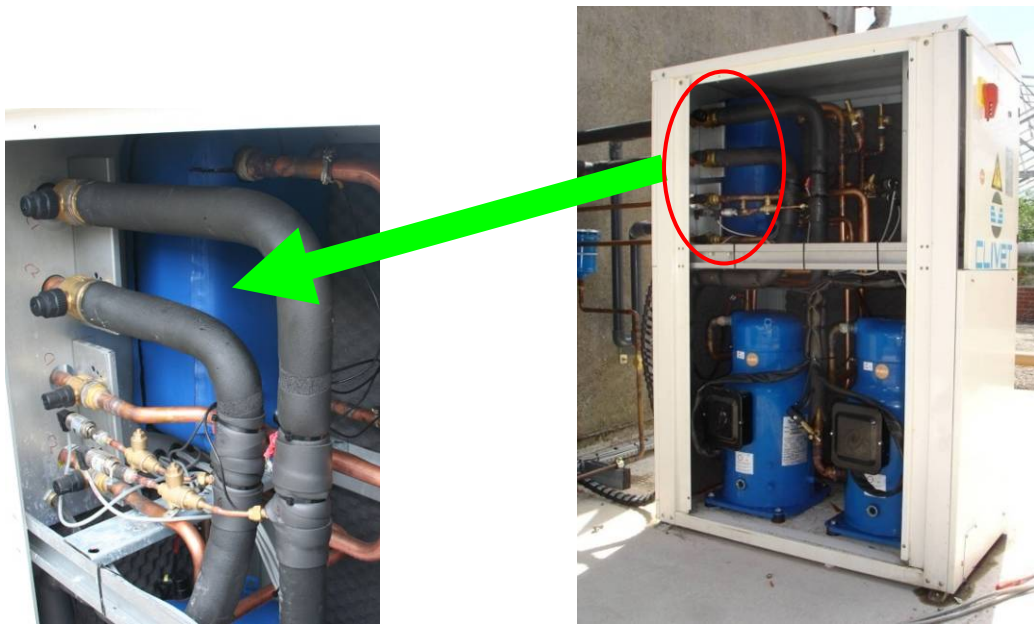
Plate heat exchanger inside water cooled refrigeration unit
